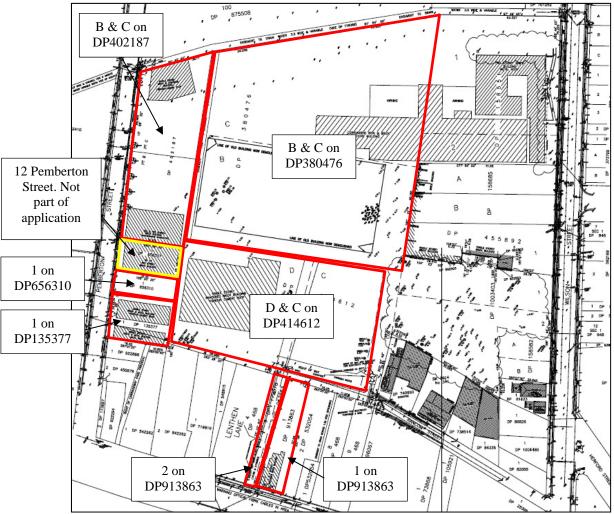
The subject development site (Source: Survey Plan submitted with application)
